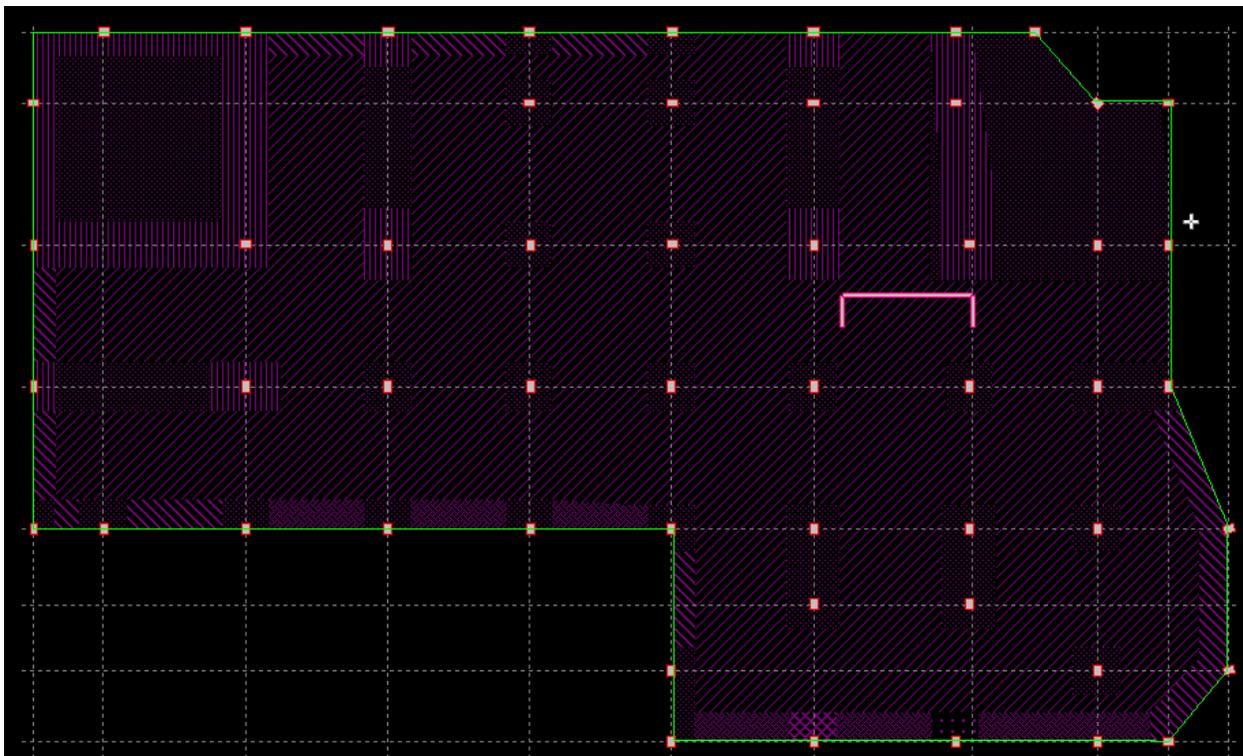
Framing Plan for Updated Concrete Structure: the different hatches shown indicate different slab thicknesses
